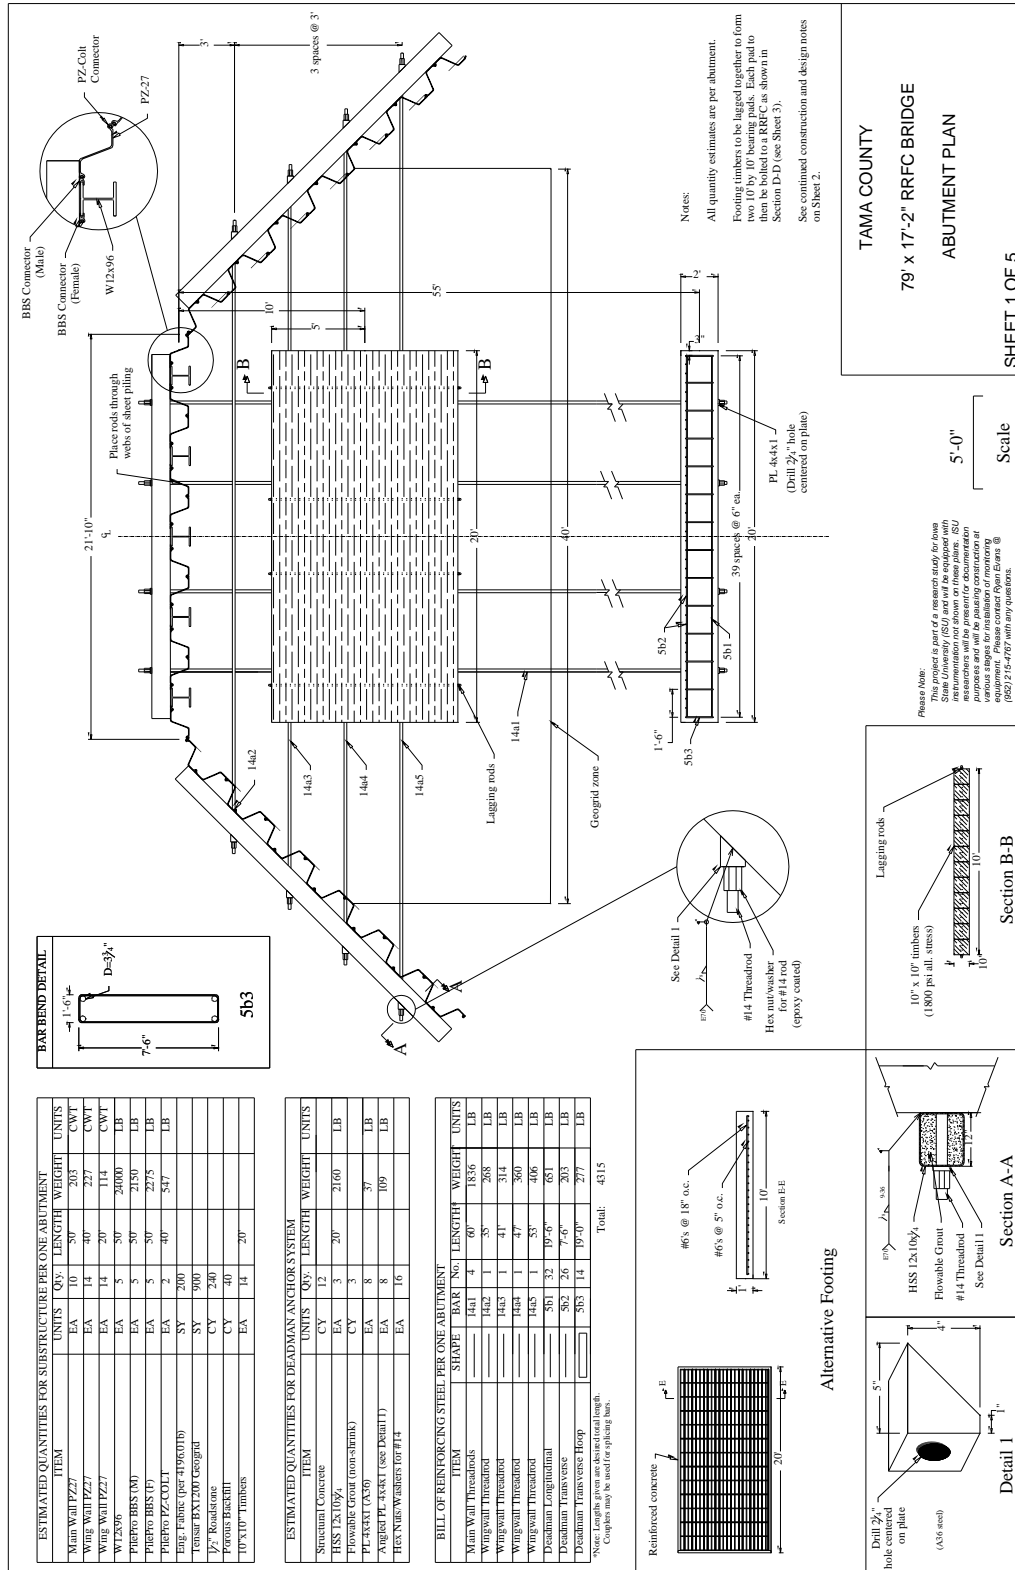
Abutment plan (alternative system) for demonstration project in TC, Iowa
